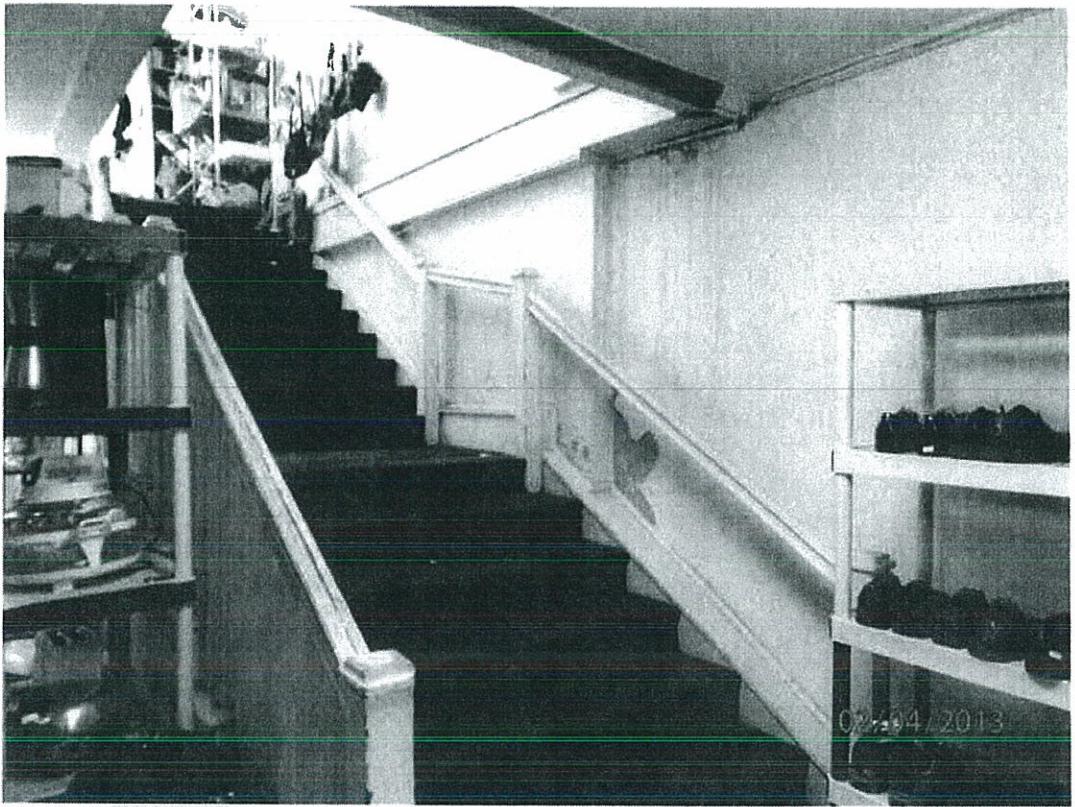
Interior Detail 2140 Market Street, Philadelphia, PA
